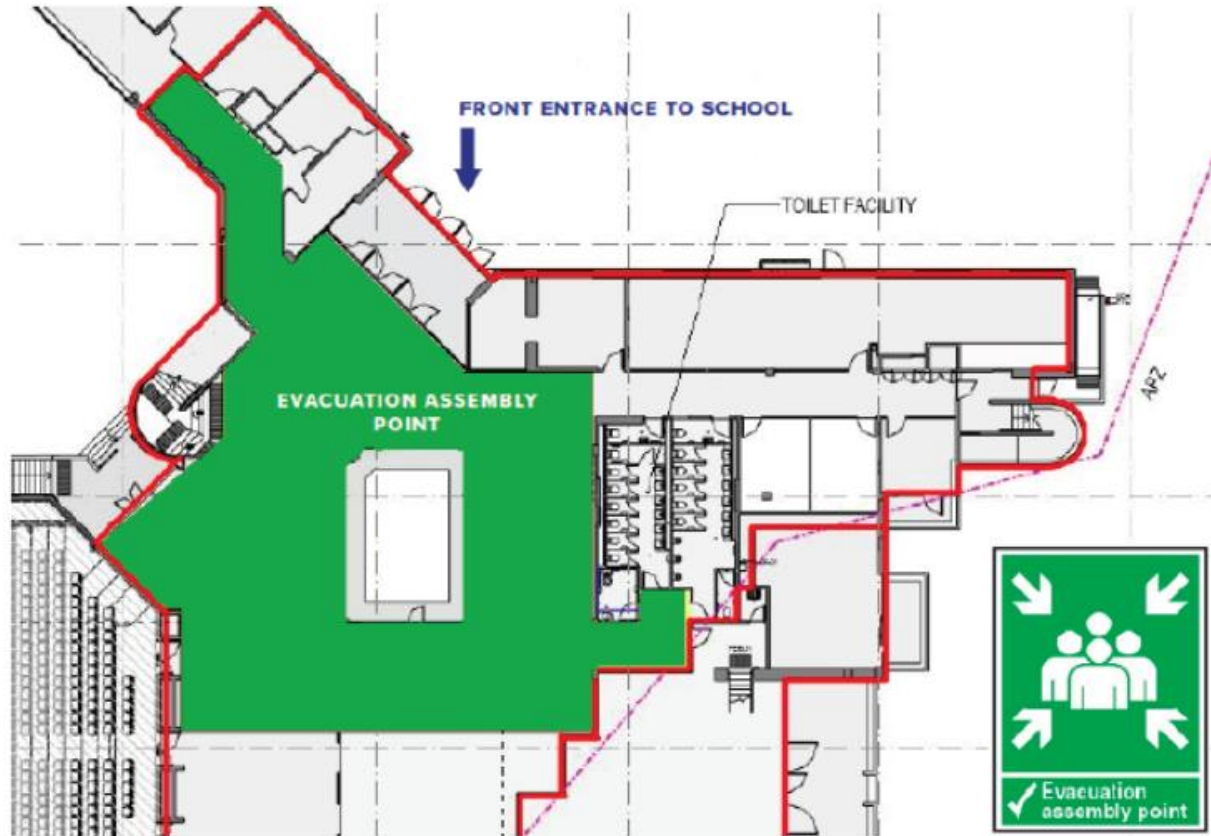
Bushfire Evacuation Assembly and Egress Route through front doors
